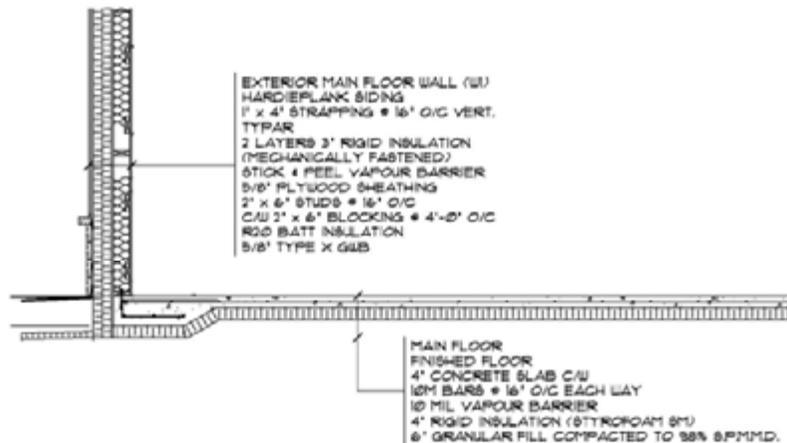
Building 2 above grade wall and slab on grade floor assembly details (N.T.S.)
